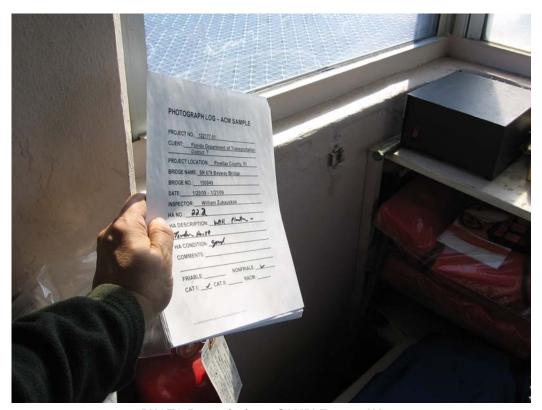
01/21/09 – SAMPLE 22.2 – HA 22 PLASTER TENDER HOUSE INTERIOR WALLS AND CEILINGS
